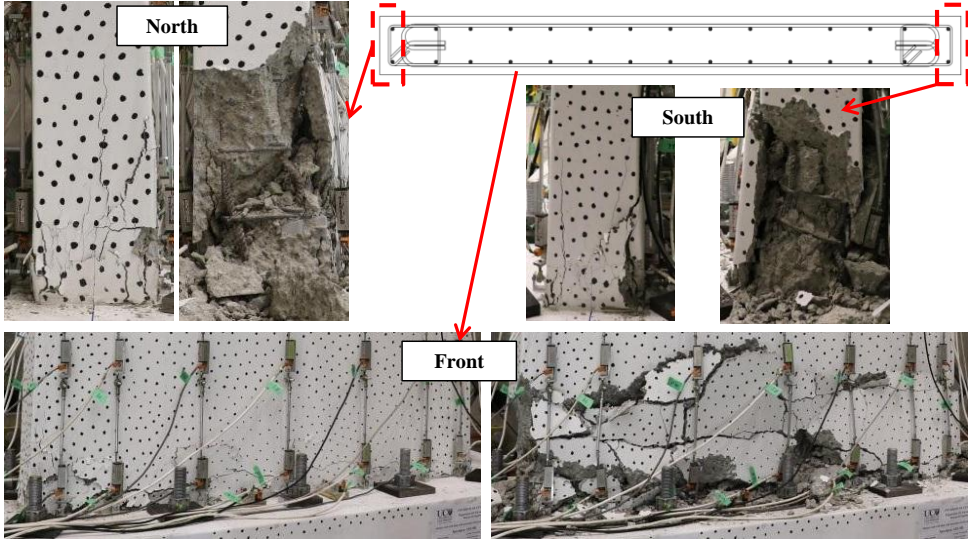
Specimen SP2-ND just before and after out-of-plane shear failure
